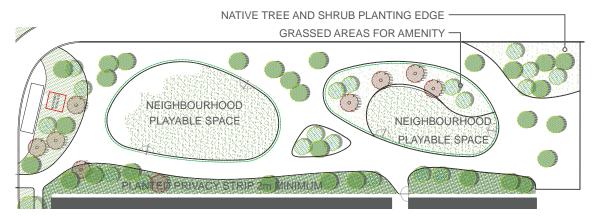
Neighbourhood Park Play Area Illustrative Plan
